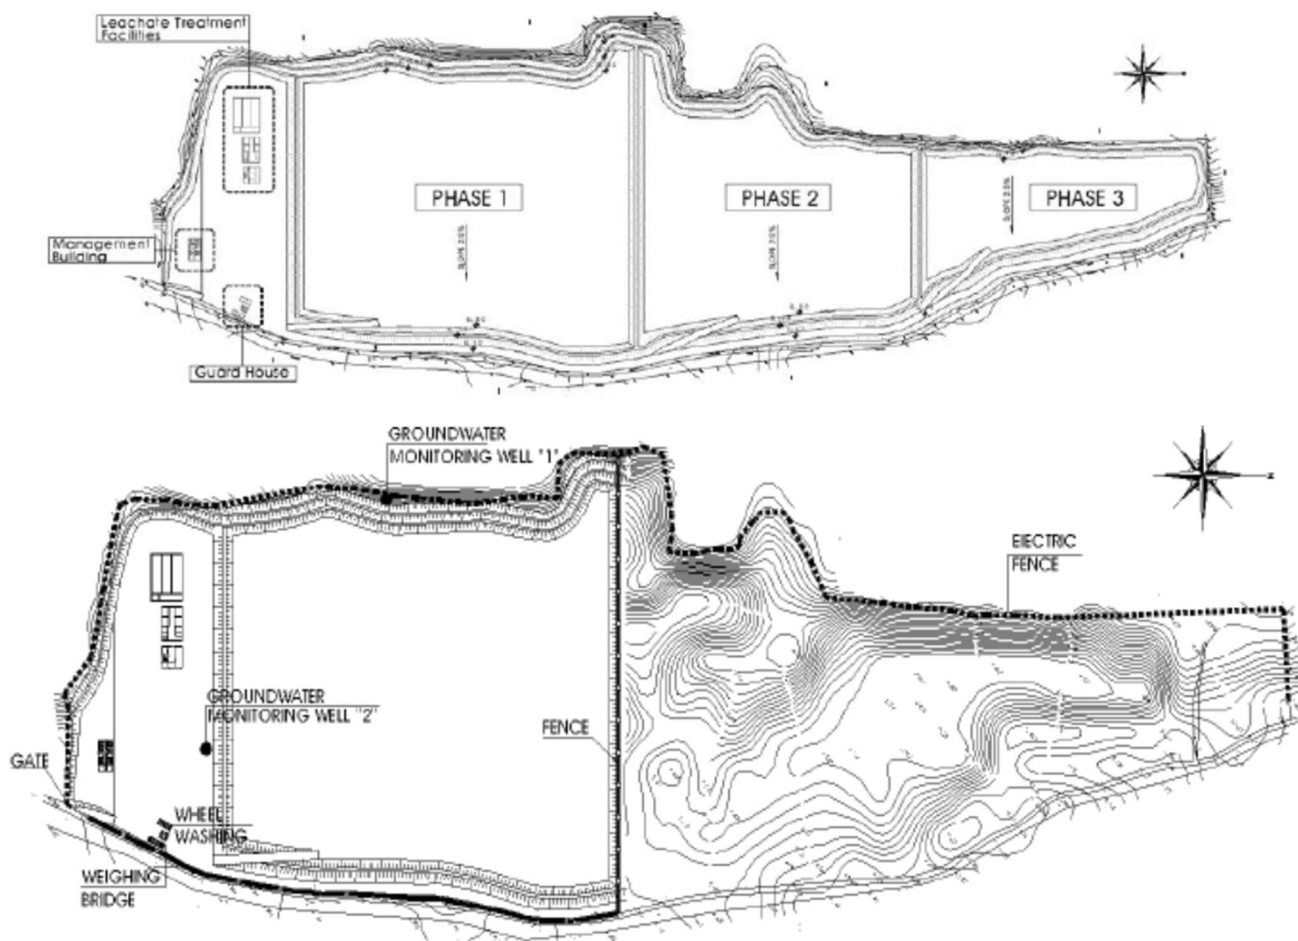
Sanitary landfill layout plan showing the location of the treatment plant, different phases planned and groundwater monitoring wells (Source: DOHWA Engineering Co Ltd et al. 2014)
